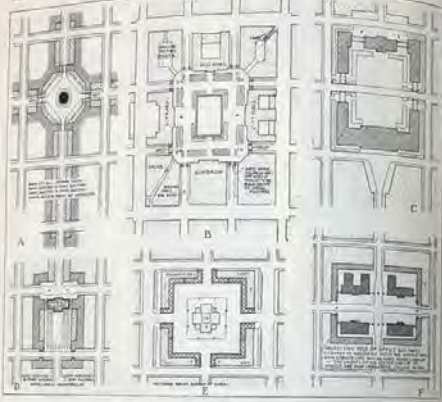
E PLANS FOR CIVIC CENTER GROUPS. These plans to be utilized, subject to the addition of further buildings and public open space. The construction of these plans see FIG. 42B-C.
